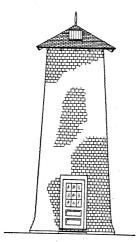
A simple frame tower would add to the protection and appearance of the tank shown in fig. 42.
